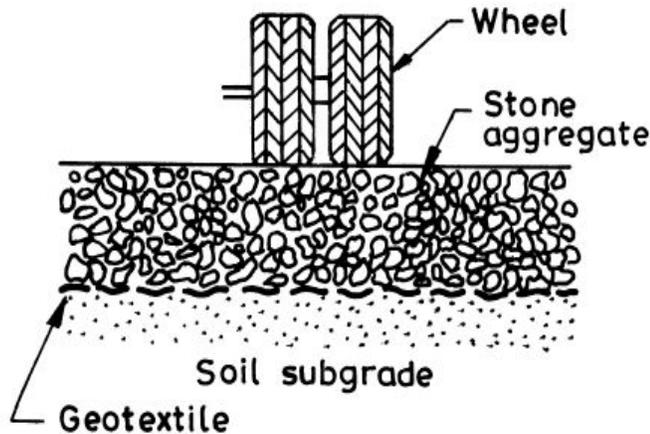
Typical cross-section of geosynthetic-reinforced unpaved road
